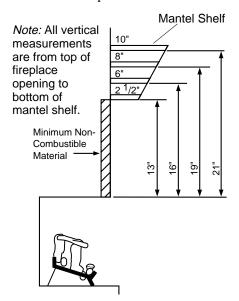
Minimum Mantel Clearances for Built-In Installation
